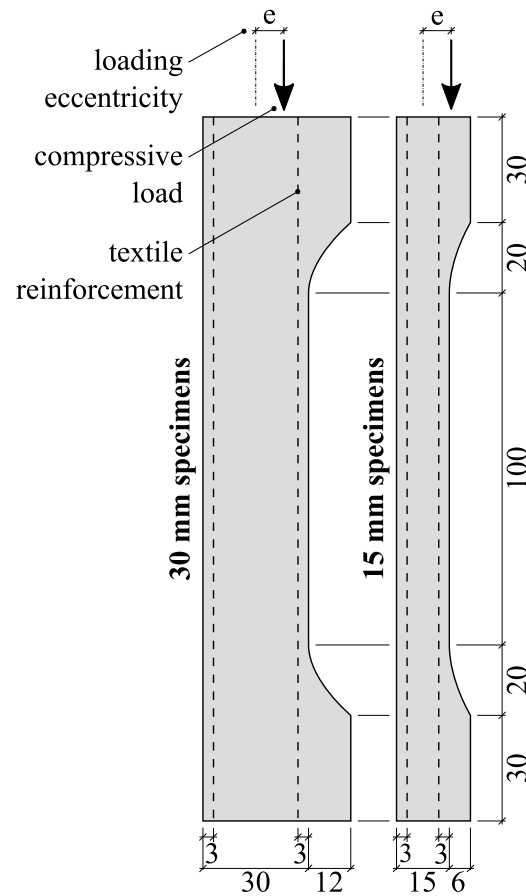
Eccentric compression test specimen geometry (dimensions in mm).
